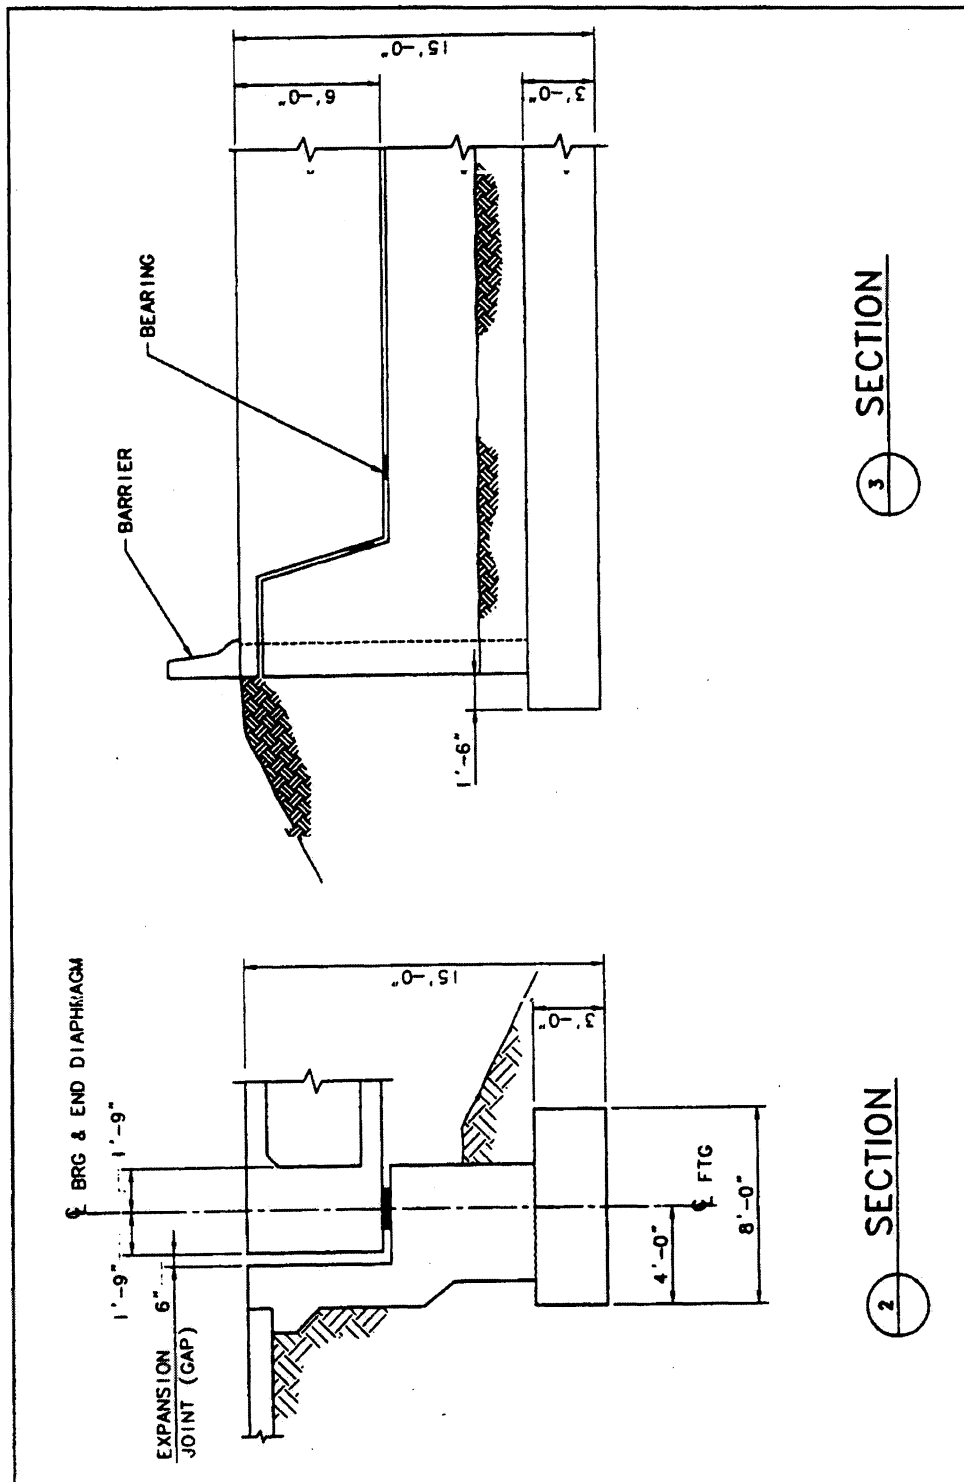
Bridge No. 4 – Seat Type Abutment
